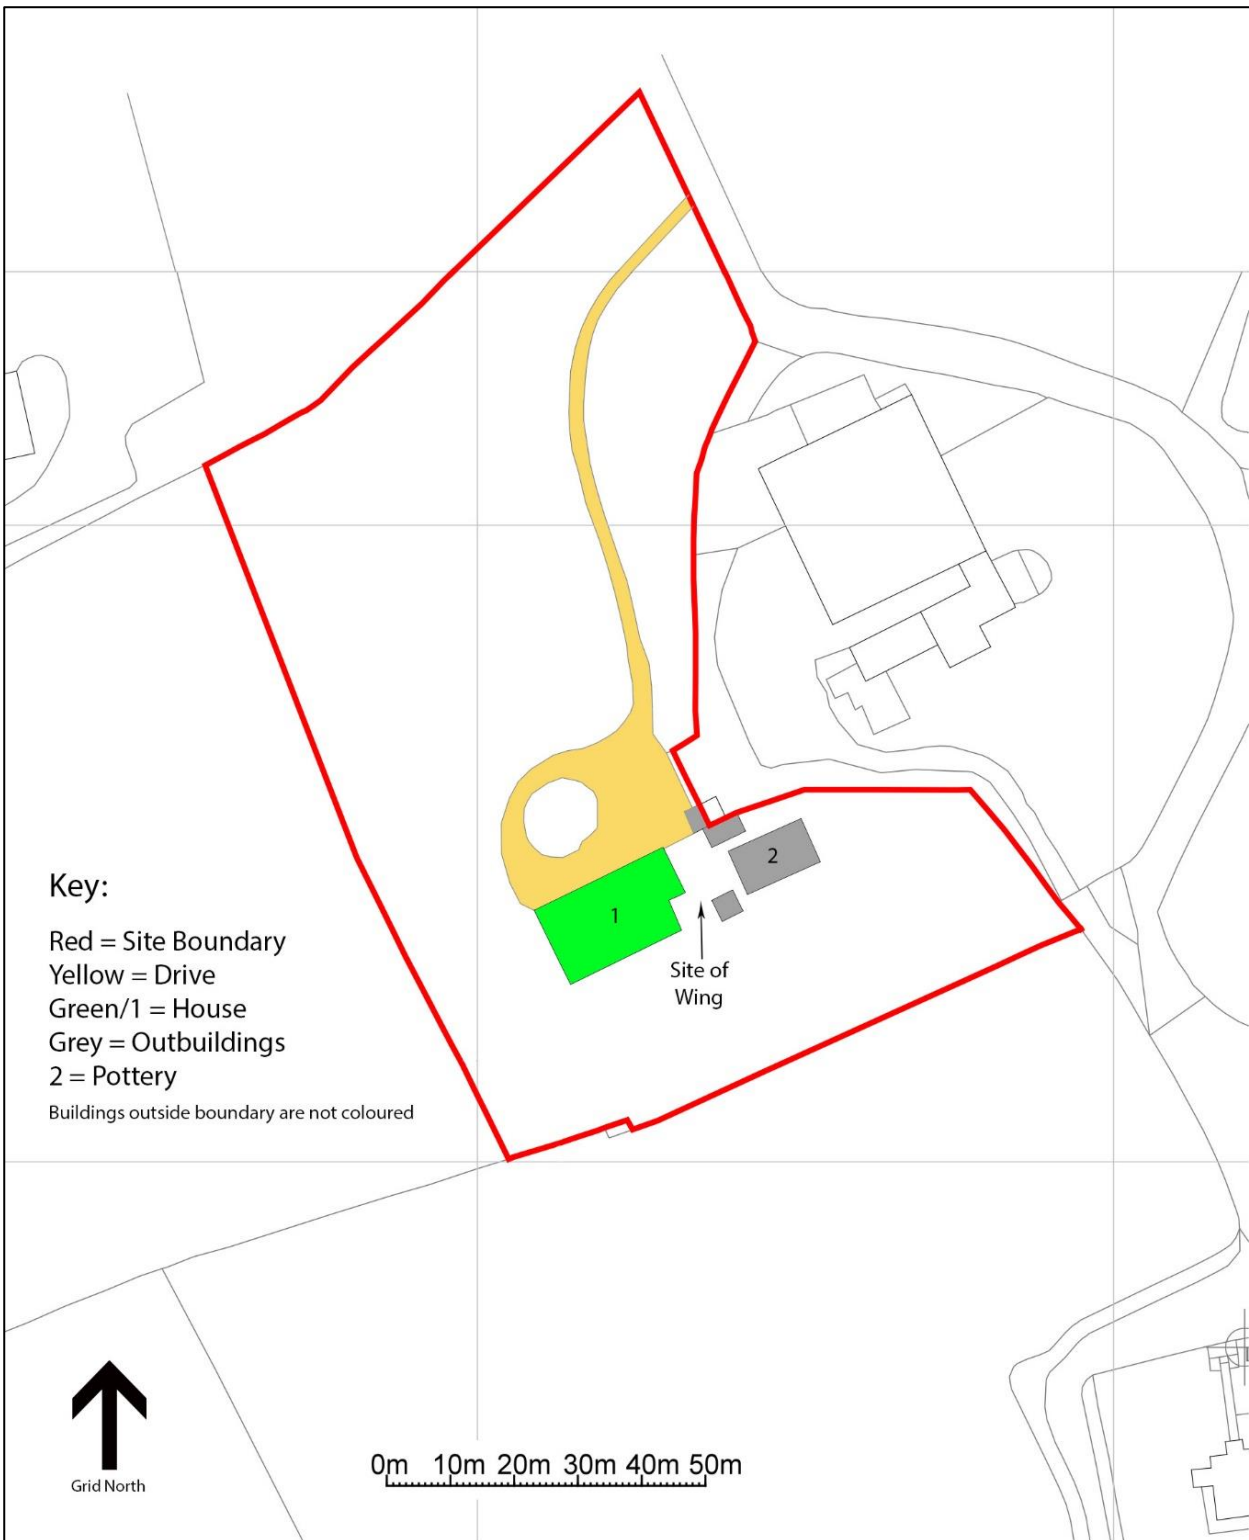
PLAN SHOWING THE SITE BOUNDARY AND LABELLED STRUCTURES. (PLAN SUPPLIED BY THE SITE AGENT).
